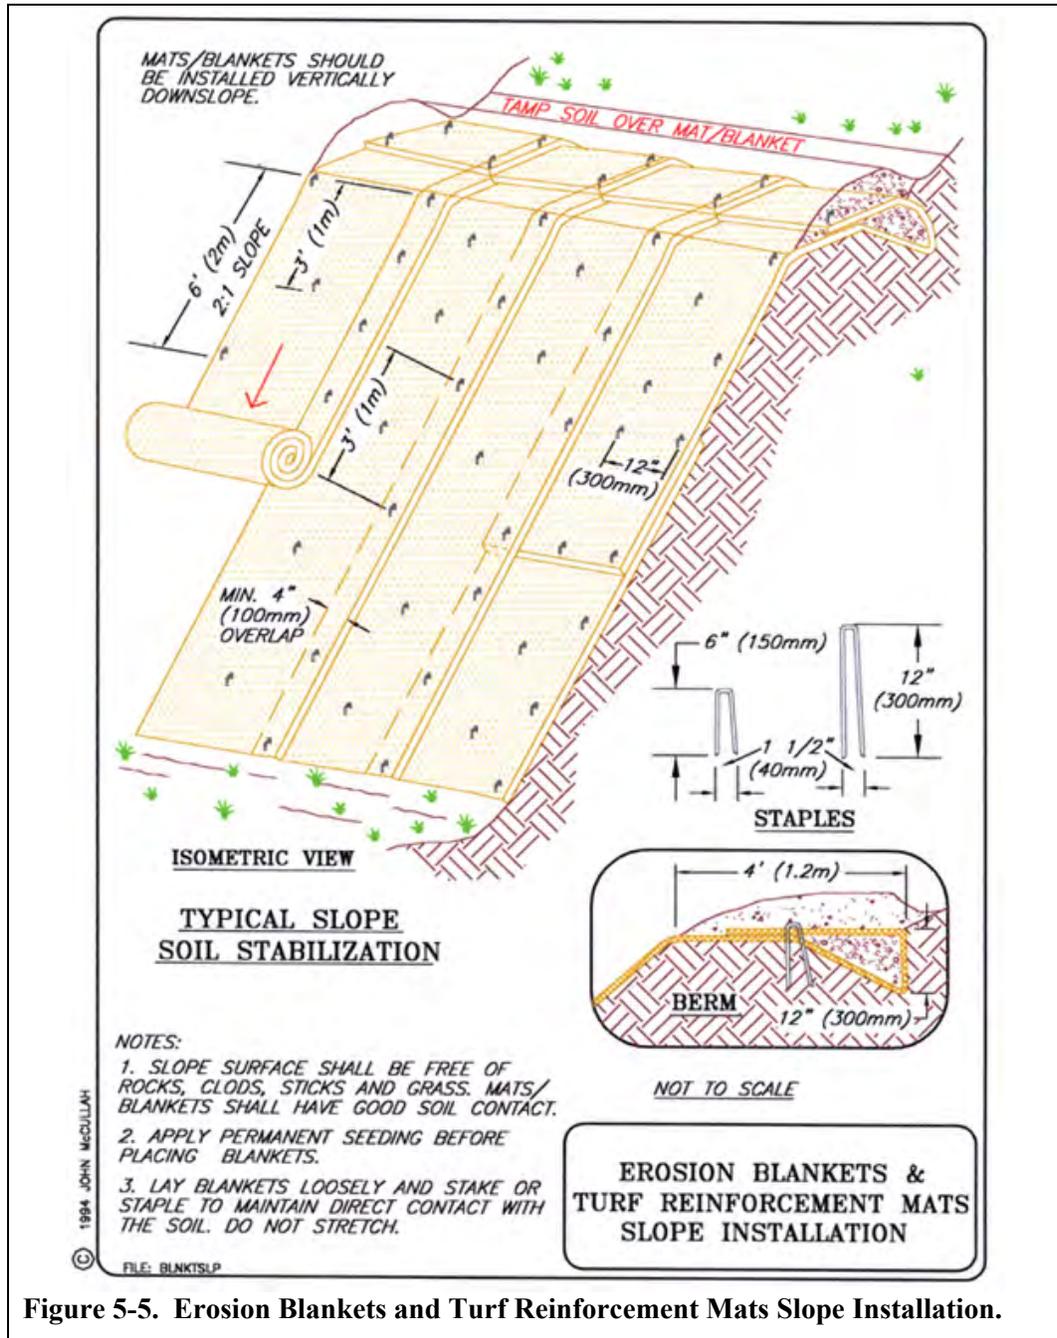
Erosion Blankets and Turf Reinforcement Mats Slope Installation.
